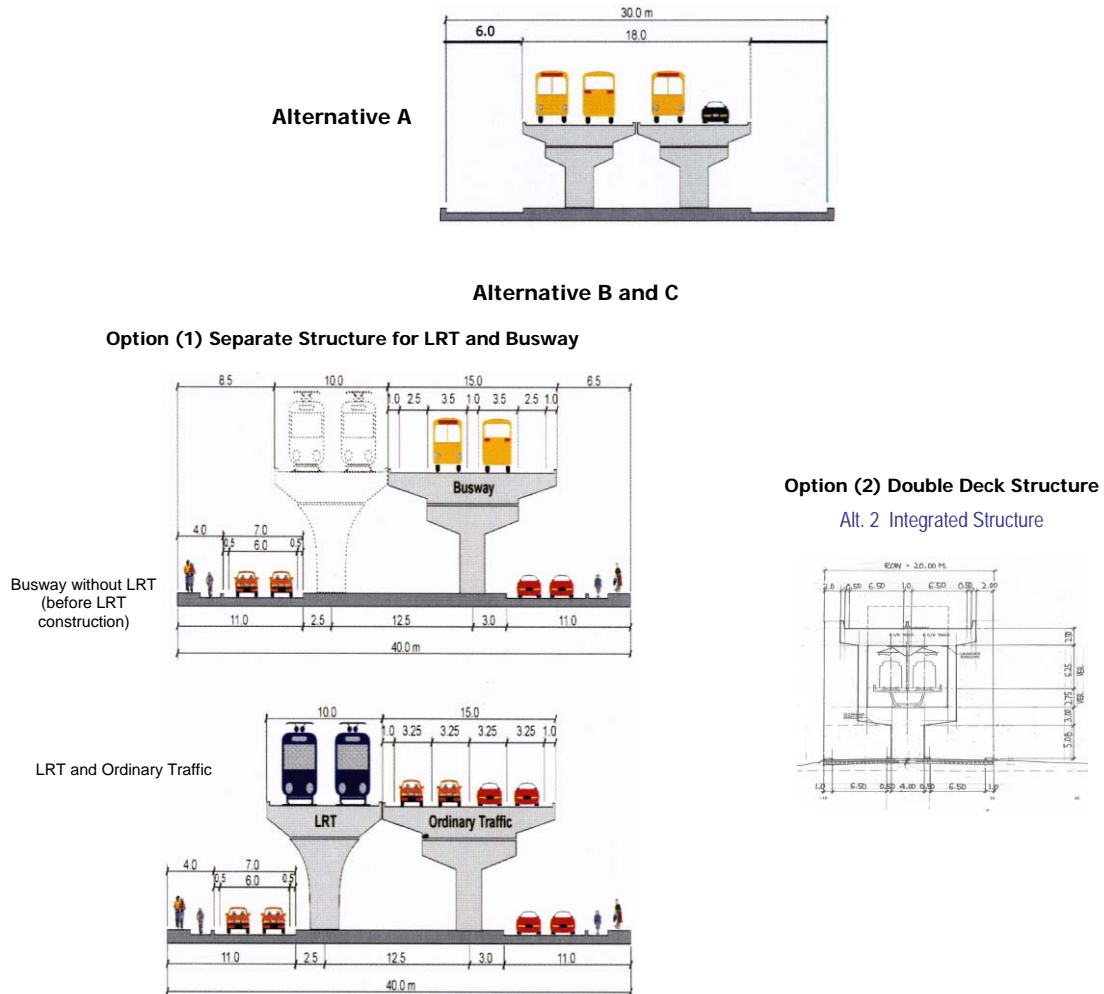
Proposed Cross-section Alternatives for Coastal Road Access
